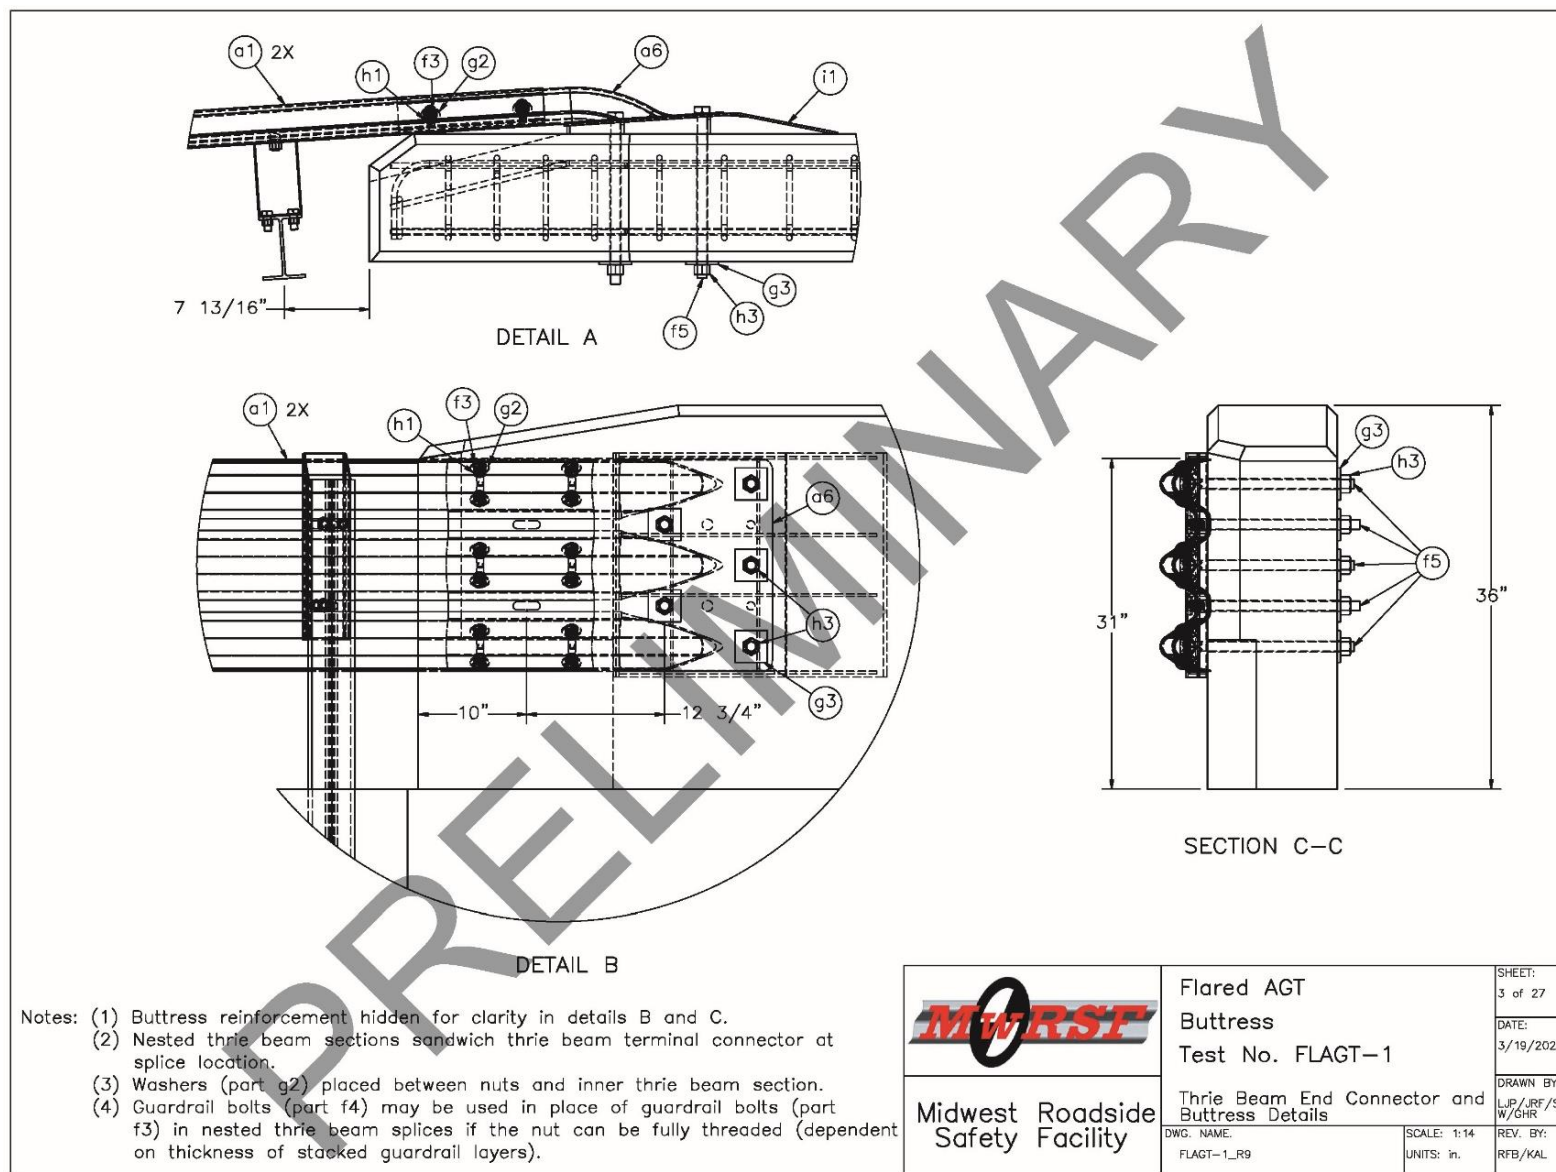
Thrie-beam End Connector and Buttruss Details, Test No. FLAGT-1
